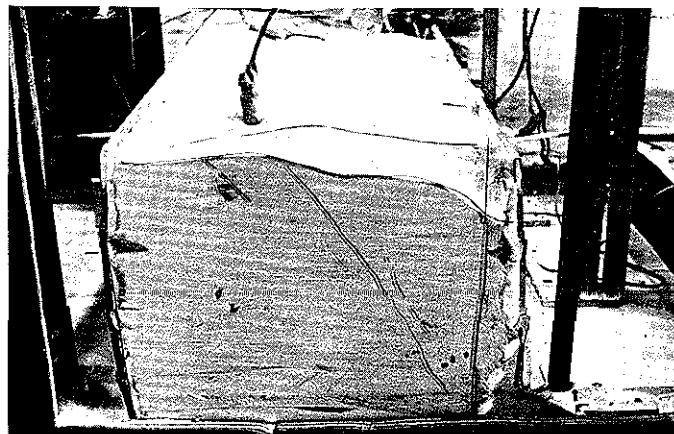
ONE-SIDED FAILURE OF MODEL WALL
